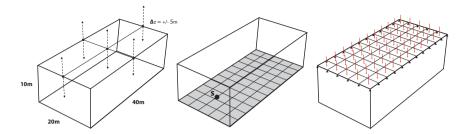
Case Study 13 Parametric Model - 40×20 Masonry Shell roof for a religious building.
